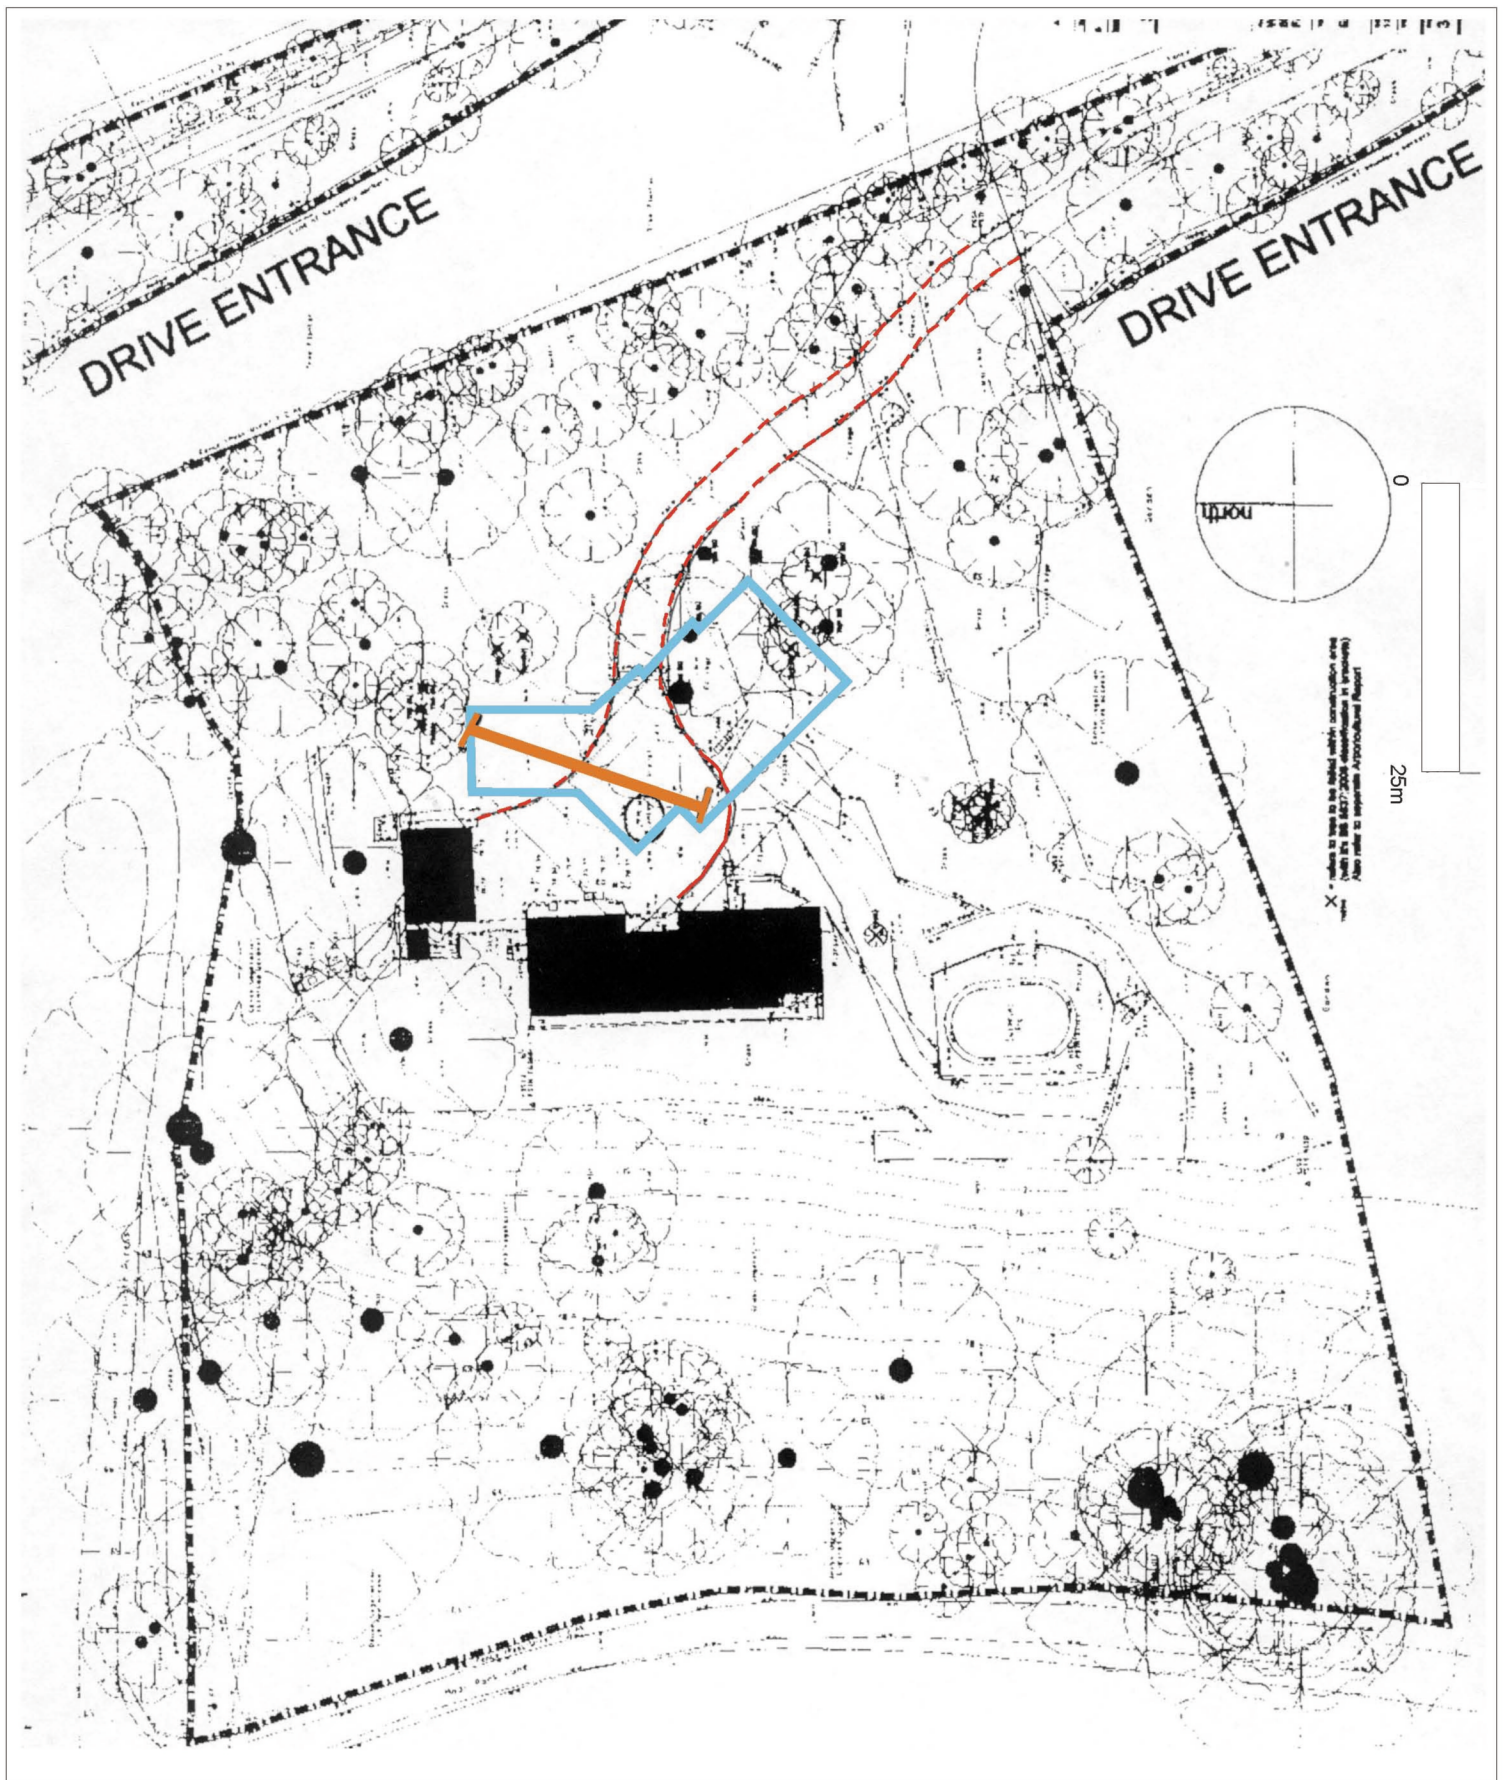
Weyhanger, 50 Compton Way, Farnham: Plan showing location of the original house (black), outline of the new house (blue), and the location of the excavated trial trench (orange)
